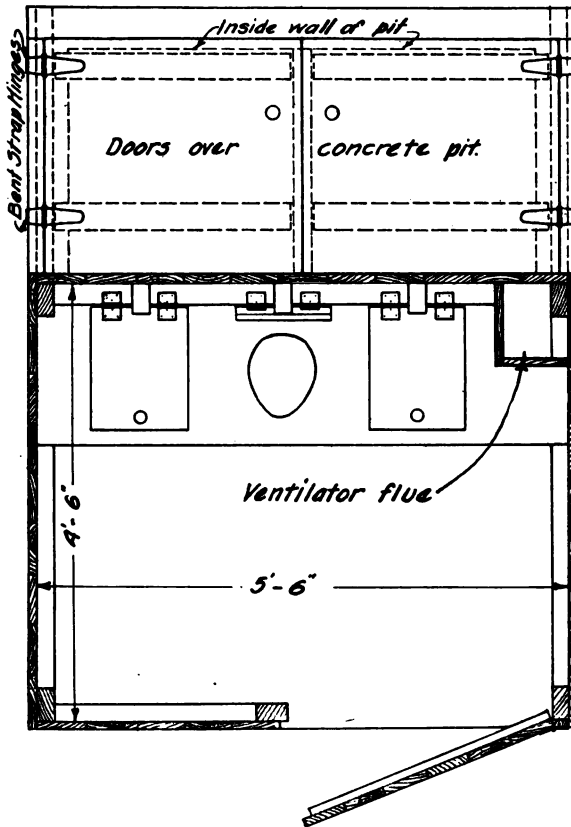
FIG. VI—A Concrete Pit Privy may be used advantageously in country schools. The above figure shows a section of such a privy cut through from front to rear.
